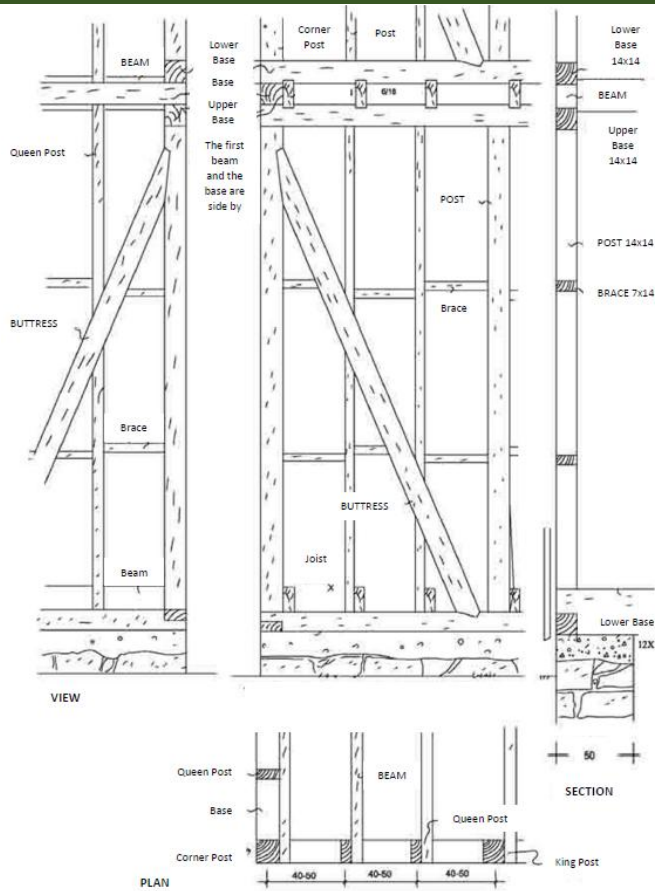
Double-floor timber load-bearing system (Eldem, 1987)
